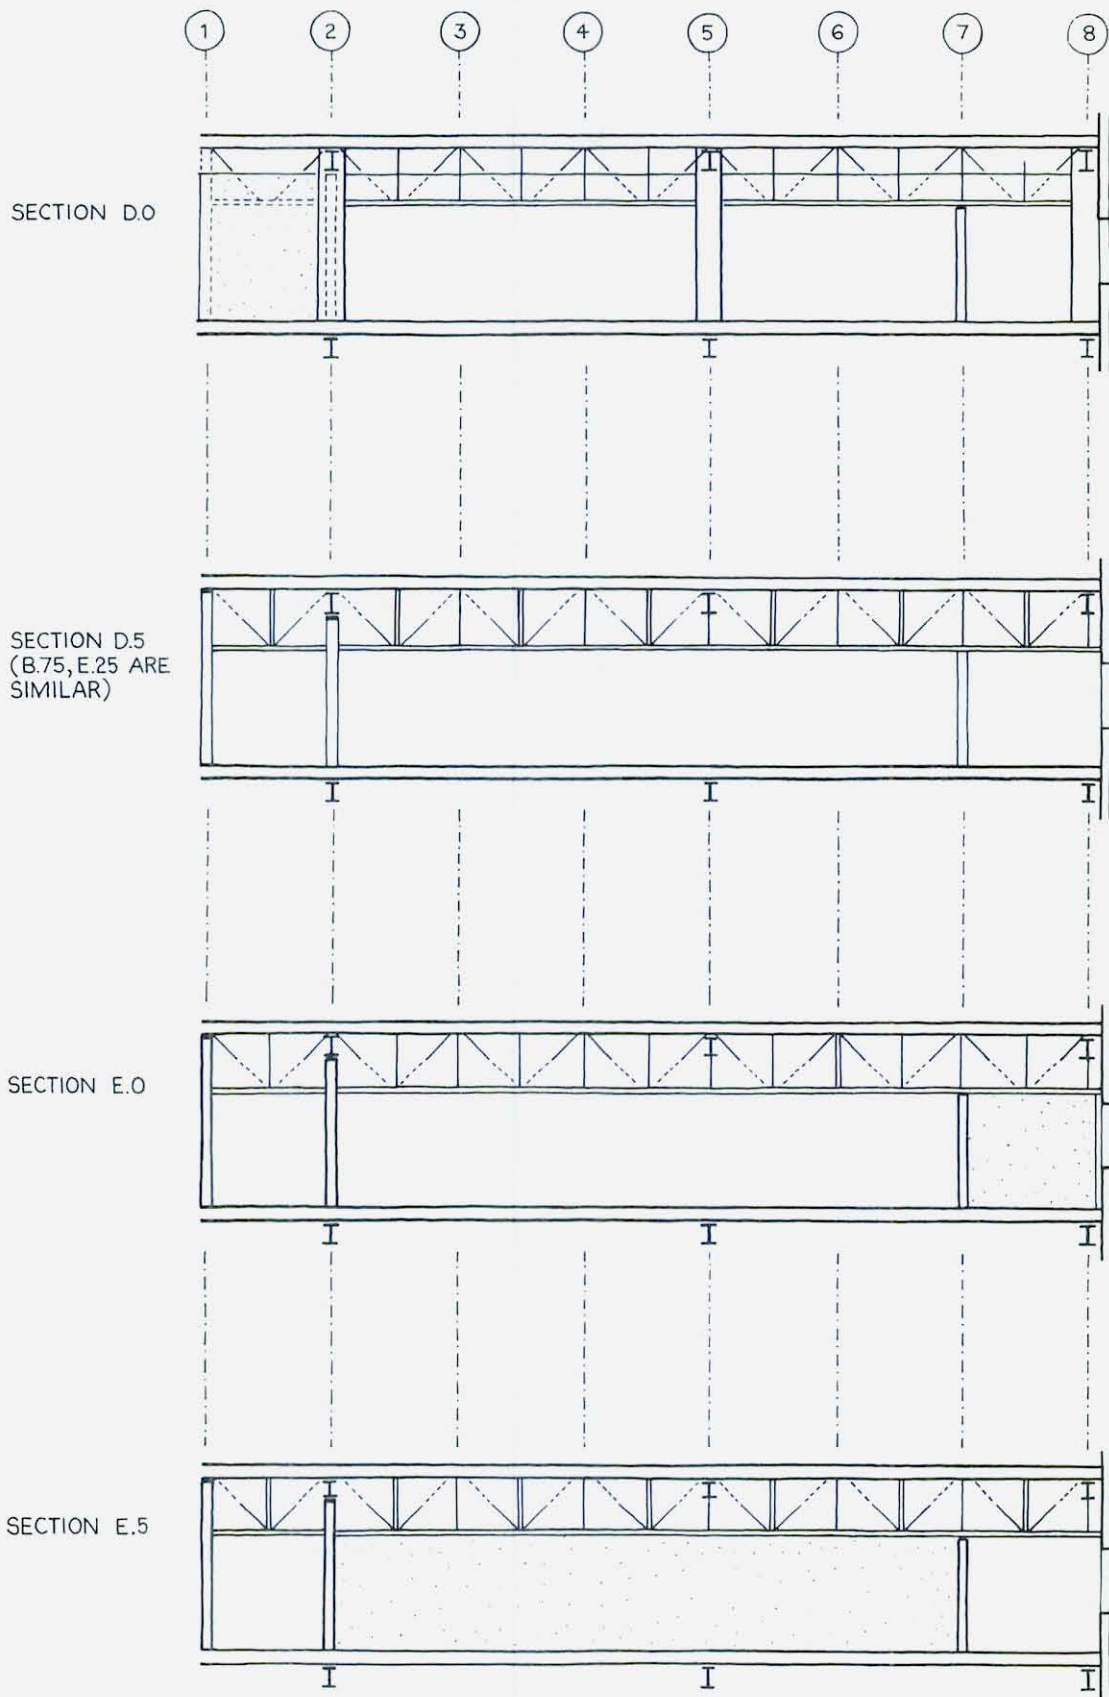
SECTIONS CORRESPONDING TO HYPOTHETICAL BUILDING PLAN.
